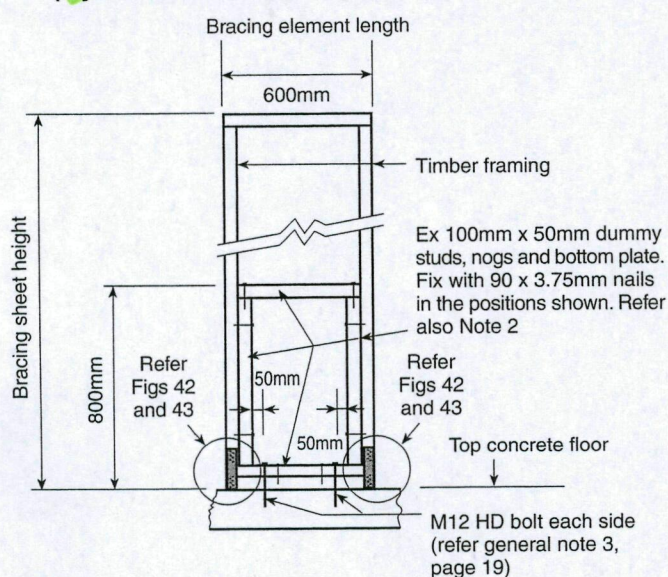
DETAIL WHEN BRACING SHEET STOPPED BELOW TOP PLATE
